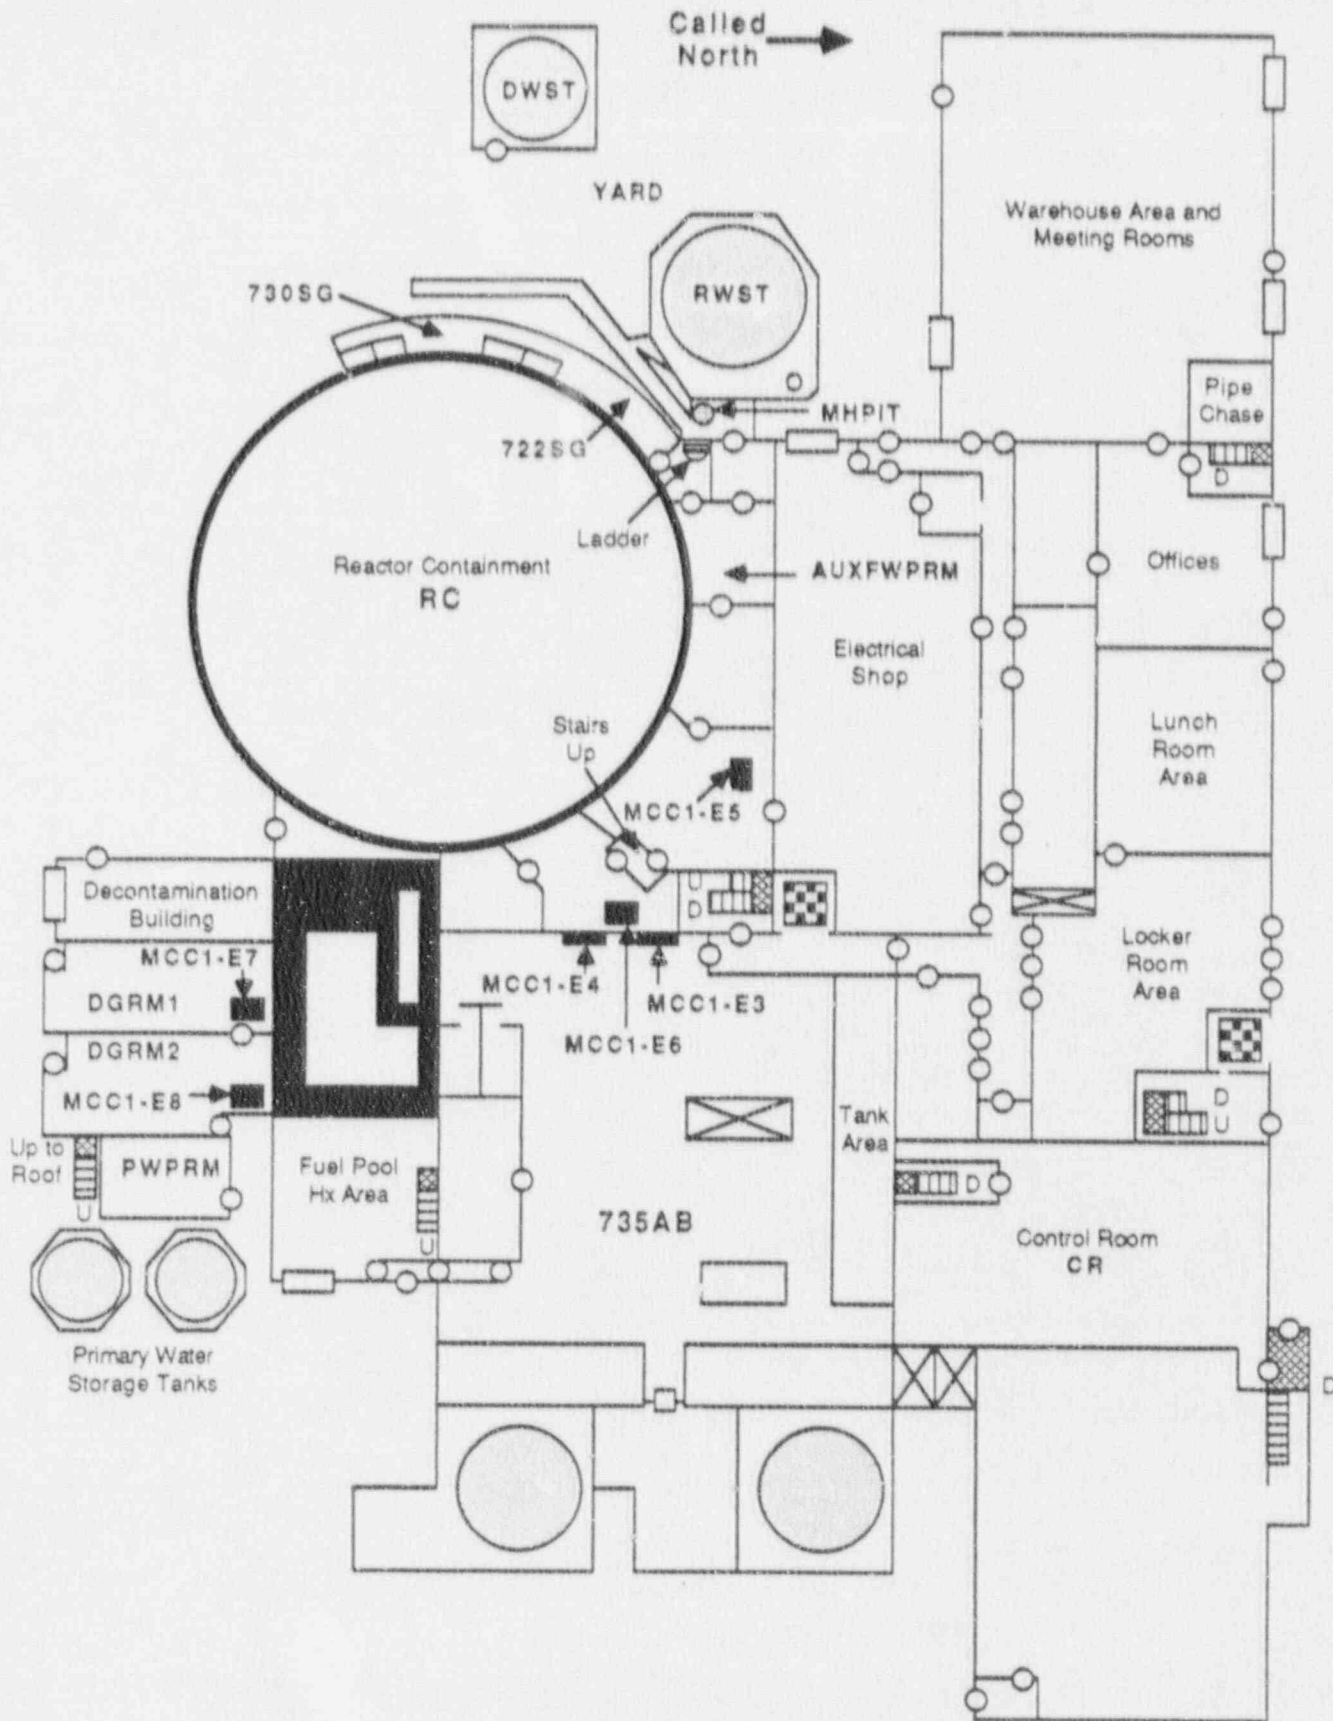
Beaver Valley Unit 1 Station Arrangement, Elevation 735'-6"
